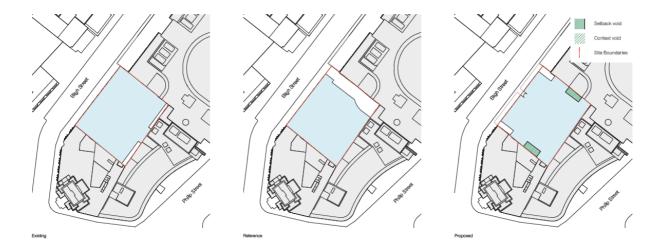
| Proposed building massing – ground floor (Source: Woods Bagot)
